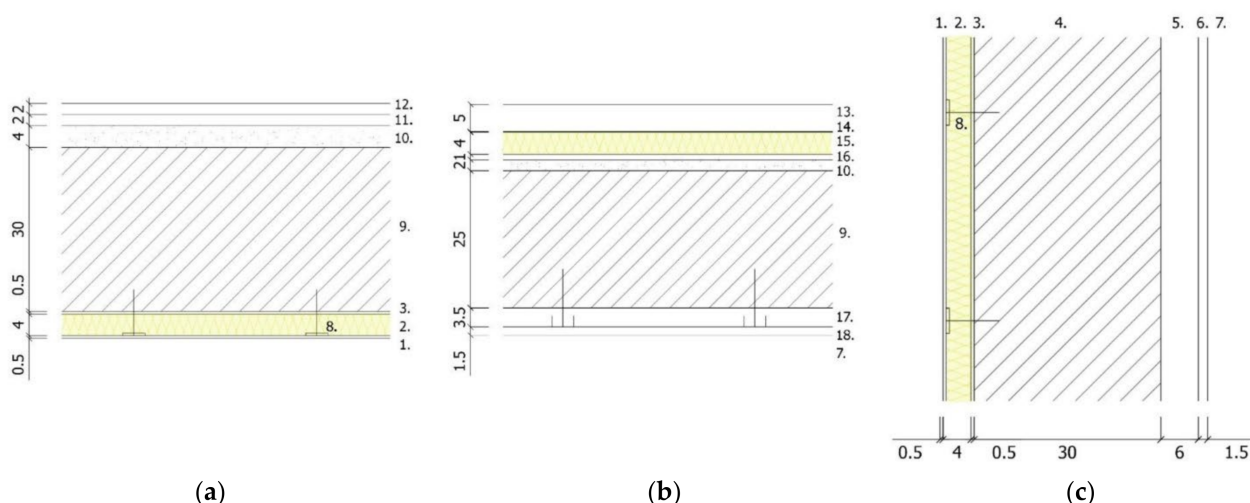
Current constructive compositions of the house: (a) construction section of the lower slab; (b) construction section of the roof; (c) constructive section of the façade wall. Materials: 1. reinforced mortar; 2. expanded polystyrene (EPS) type 3; 3. bonding mortar; 4. reinforced concrete wall; 5. ceramic brick; 6. gypsum plaster; 7. plastic paint; 8. anchoring elements; 9. reinforced concrete slab; 10. self levelling mortar; 11. bonding mortar; 12. natural stone (white marble); 13. gravel Ø2–3 mm; 14. geotextile film; 15. extruded polystyrene (XPS); 16. polyester film; 17. air chamber; 18. plasterboard cladding; 19. $U_g = 2.80 \text{ W/m}^2 \cdot \text{K}$; 20. $g = 0.78$; 21. $g_{gl,sh,wi} = 0.51$; 22. $U_f = 3.5 \text{ W/m}^2 \cdot \text{K}$ (dimensions in cm).
